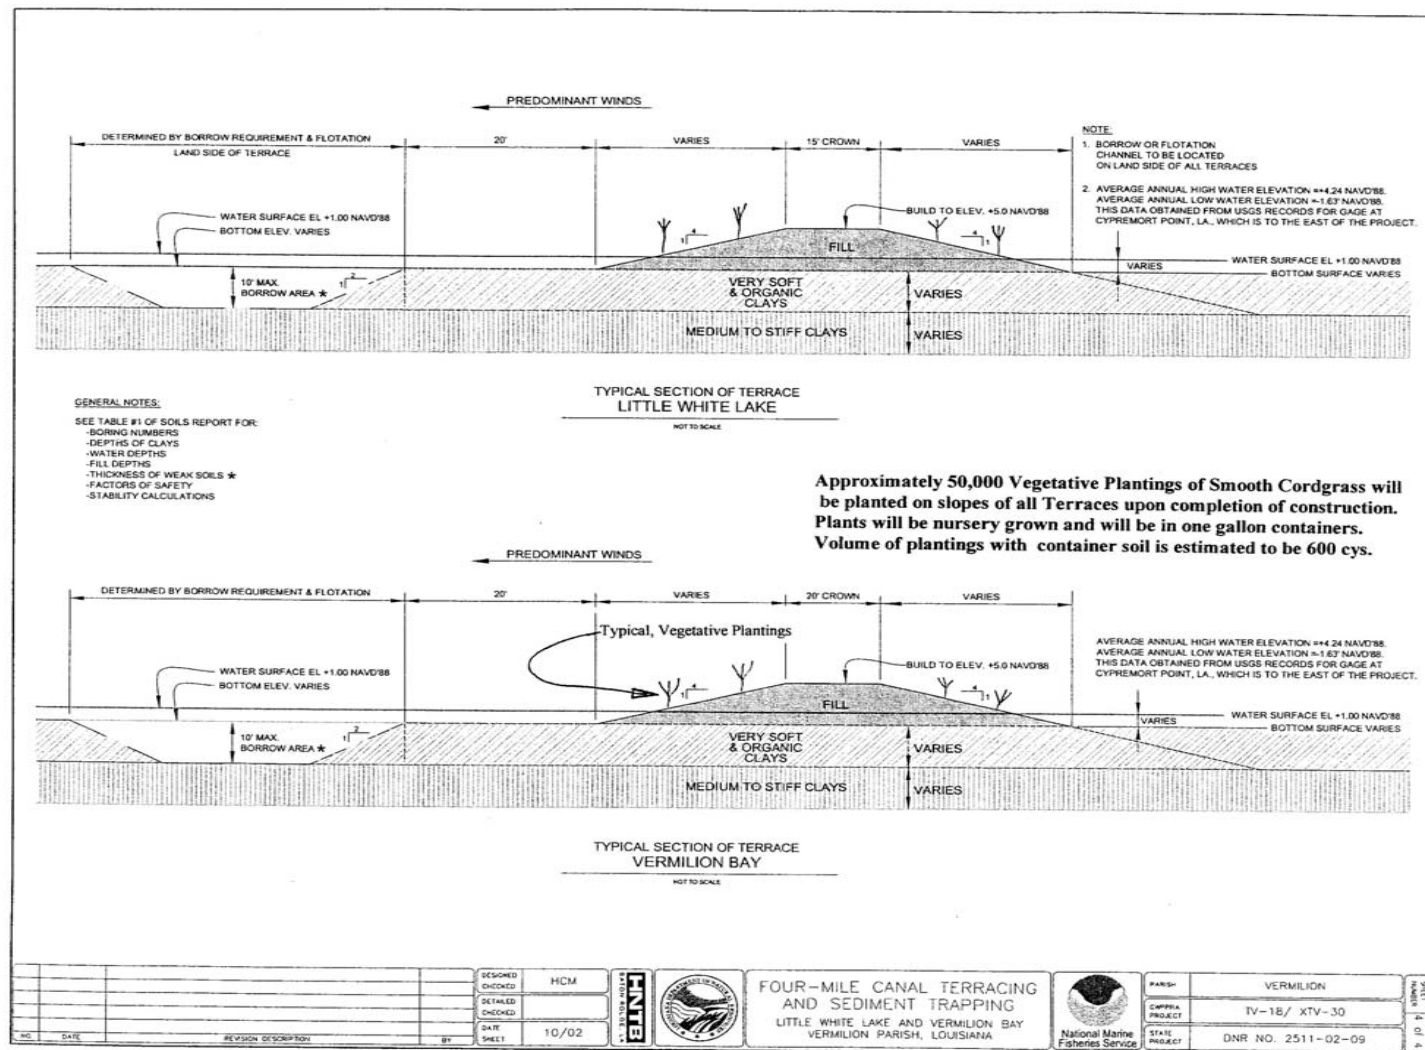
Typical layout and cross section of proposed terraces to be constructed in Little Vermilion Bay and Little White Lake for the Four-Mile Canal Terracing and Sediment Trapping (TV-18) project (HNTB 2002).
